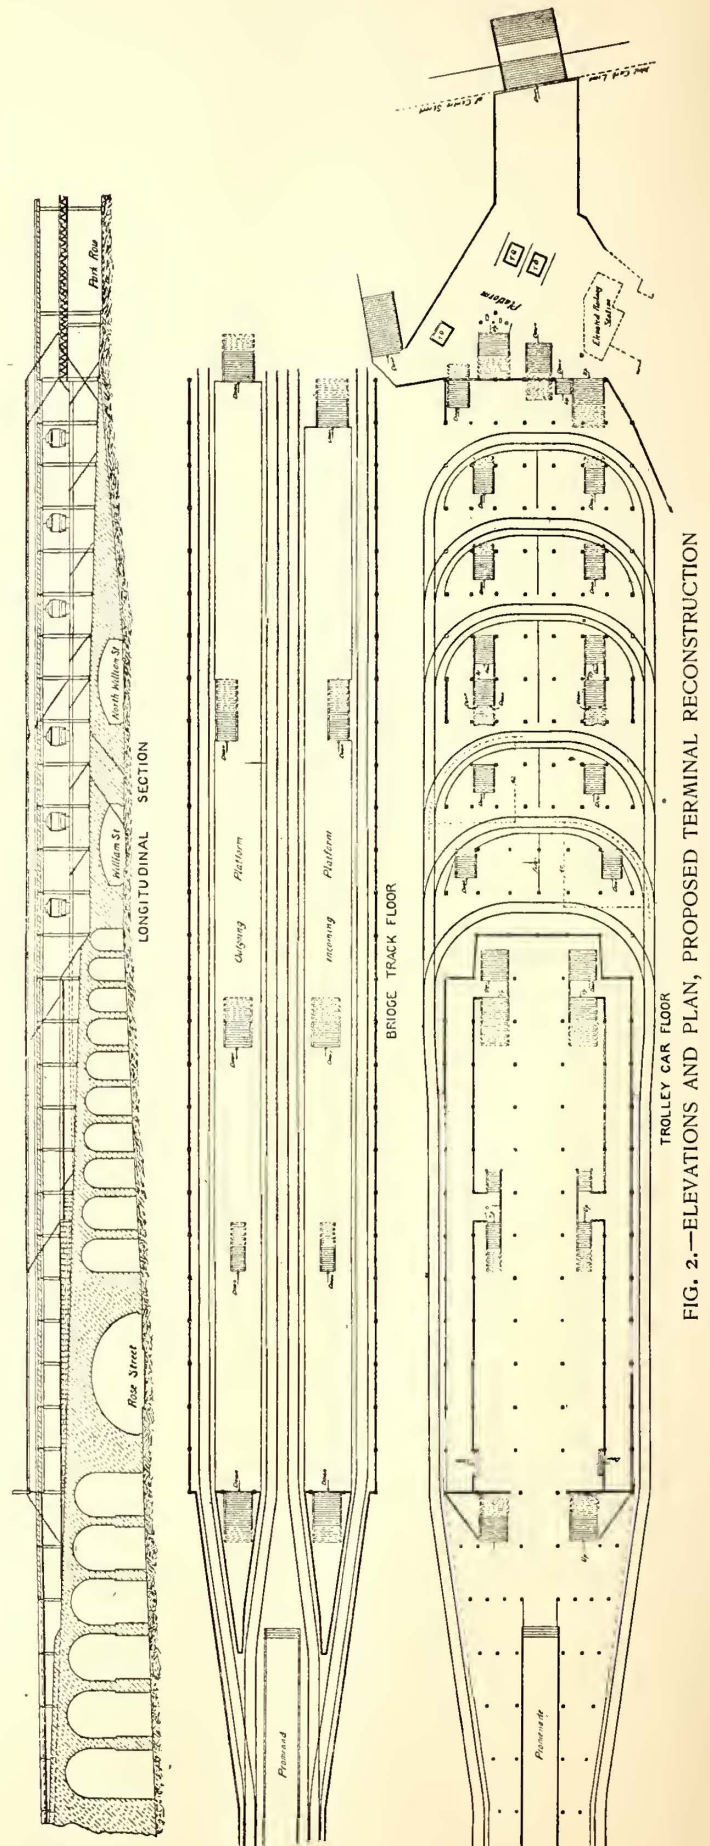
ELEVATIONS AND PLAN, PROPOSED TERMINAL RECONSTRUCTION
